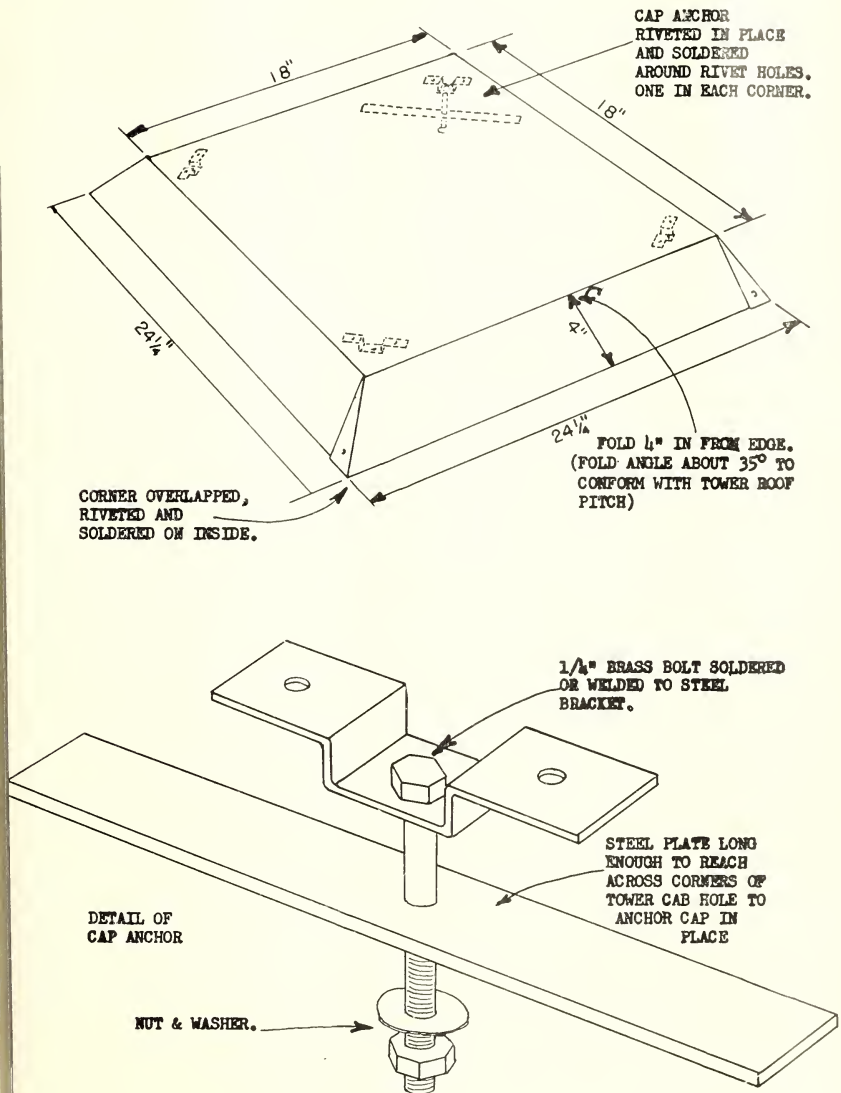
Schematic drawing of cap to cover access hole in roof of 7- by 7-foot tower cab.
